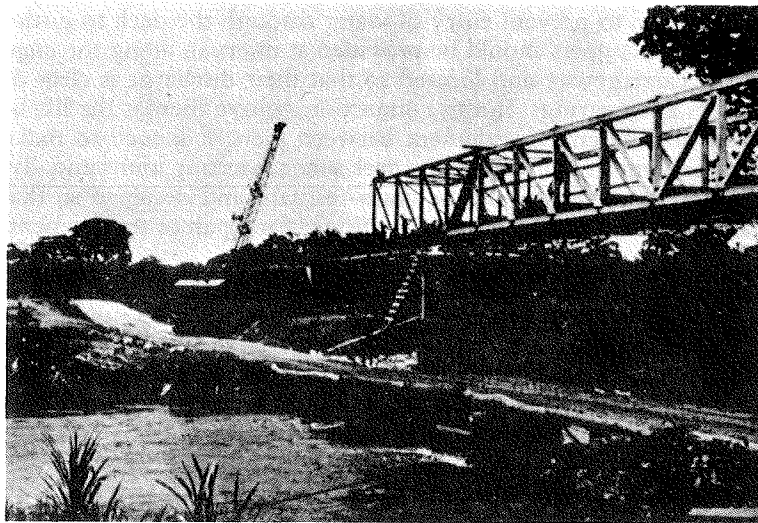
Dismantling launching nose from steel bridge in Sierra Leone.
